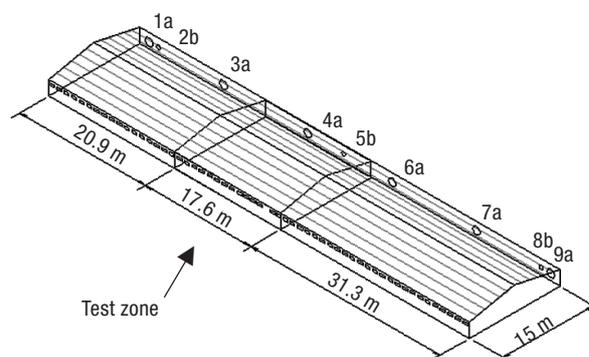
Commercial poultry building showing the experimental test zone, 56 wall inlets and 9 exhaust fans (six type «a» and three type «b»).
